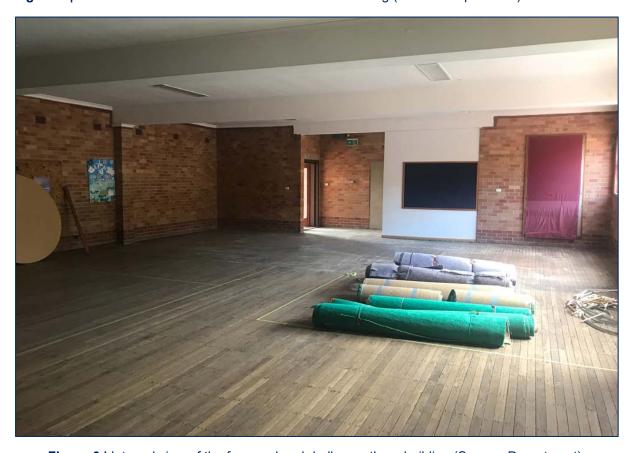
| Internal view of the former church hall – southern building (Source: Department)
